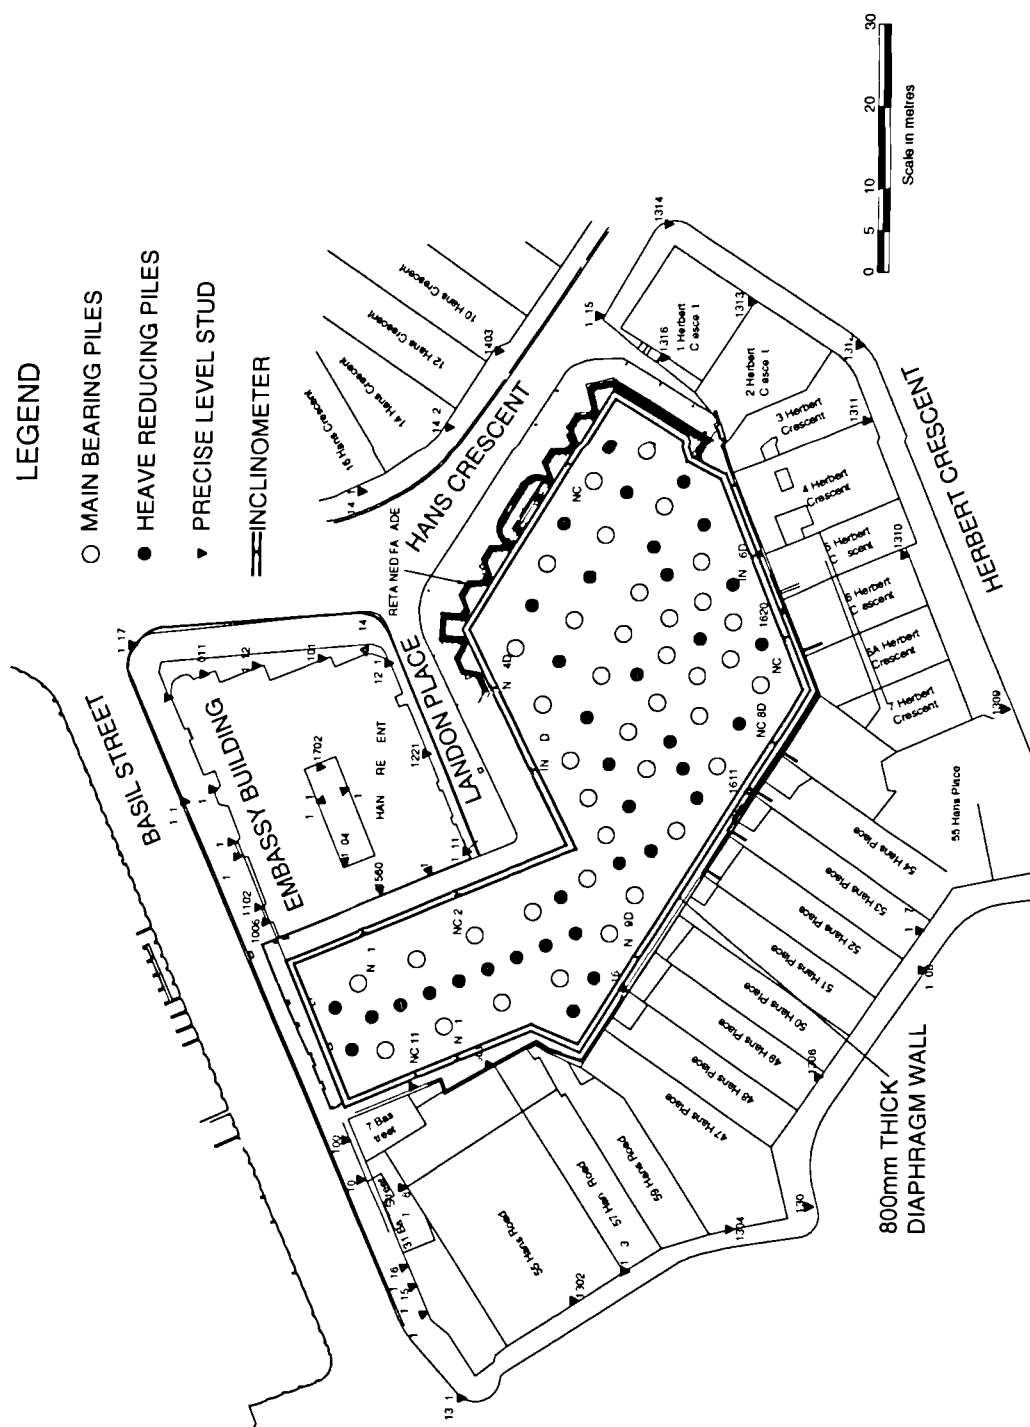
Site of the former Knightsbridge Crown Court showing the outline of the diaphragm wall and the pile layout. Also shown are positions of inclinometers and precise levelling studs that formed part of the monitoring during construction
